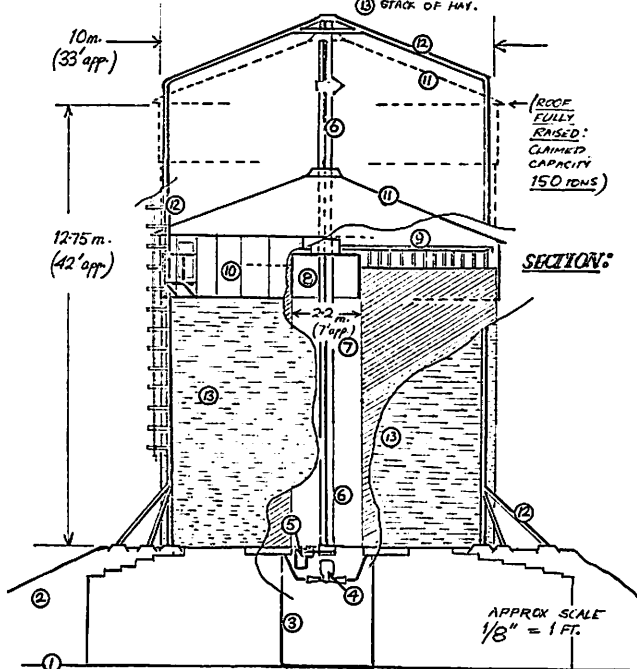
Hay hill side elevation. (See also Appendix page 16)
